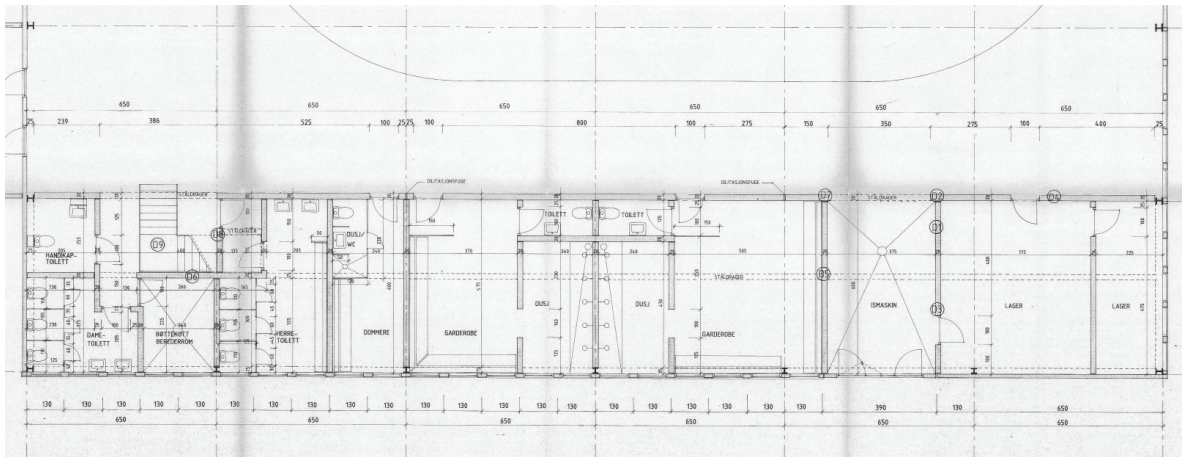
Original plan drawing, room layout in the west side of the hall.
